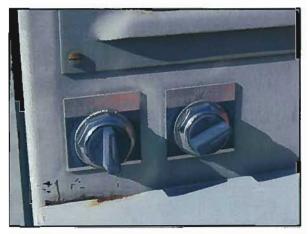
DVC Engineering Technology Building VFD Switched to Bypass Mode
